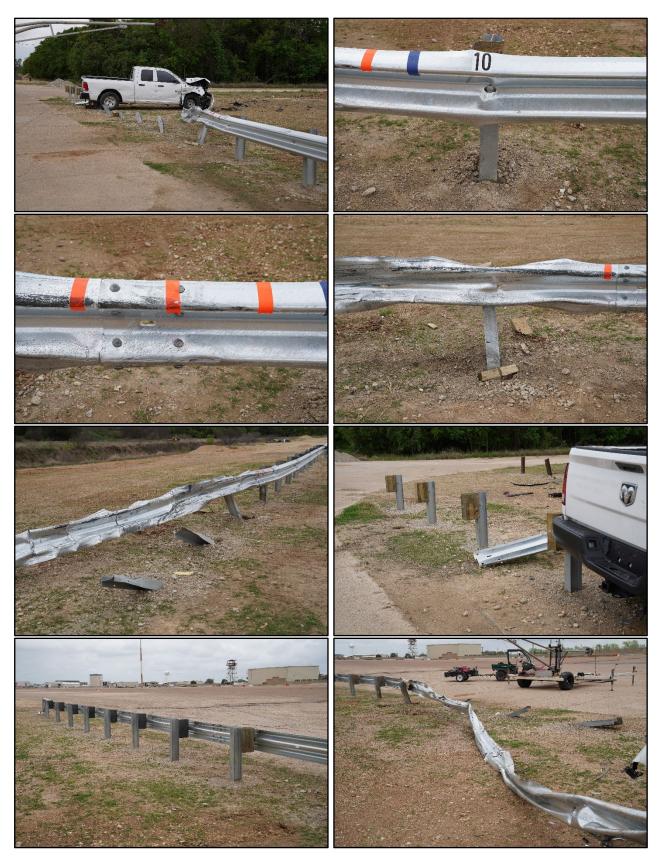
Guardrail without downstream anchorage after Test No. 614721-01-2.
